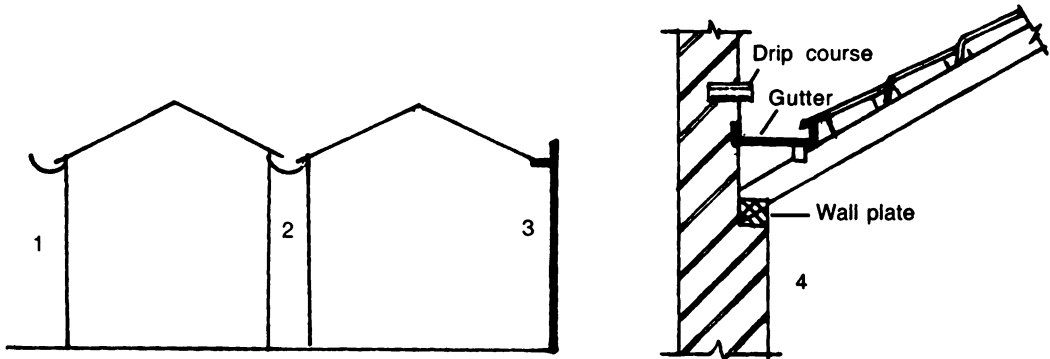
Gutters in sloped roofs: 1. Eave gutter, 2. Valley gutter, 3. and 4. Boundary wall gutters.
